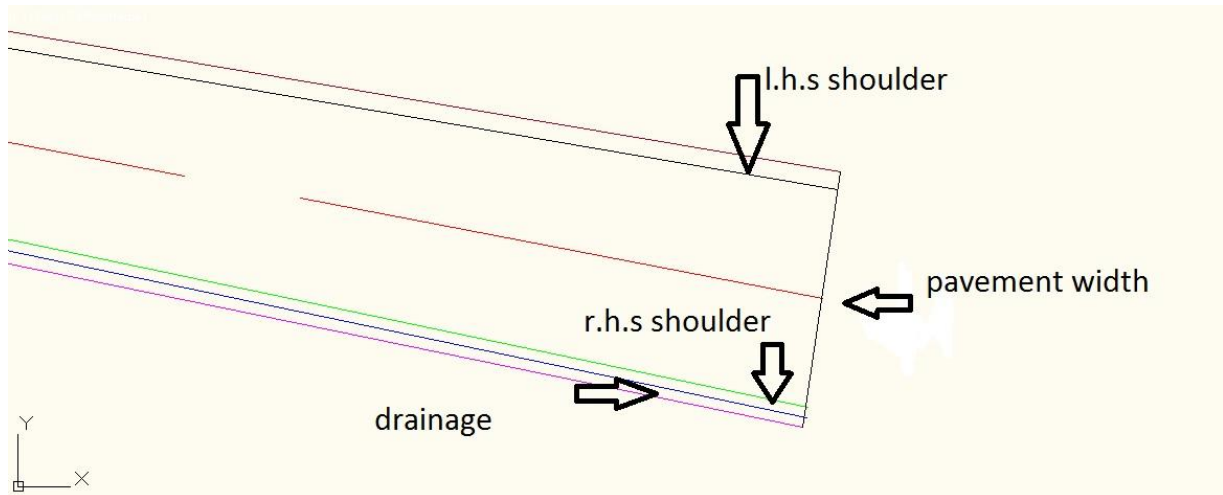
Image showing L.H.S shoulder width ,Pavement width , R.H.S shoulder width and drainage width
